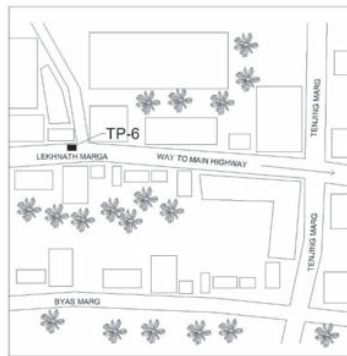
Tentative Site Plan of TP-6 (Sallish Mandir Road)
